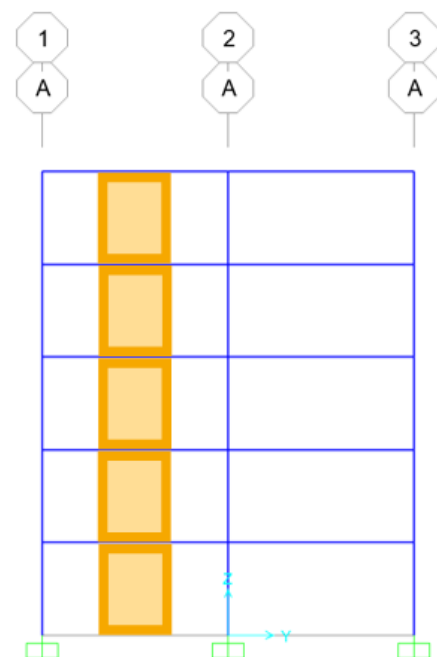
Positioning of shear walls over the five floors in a transversal frame.
